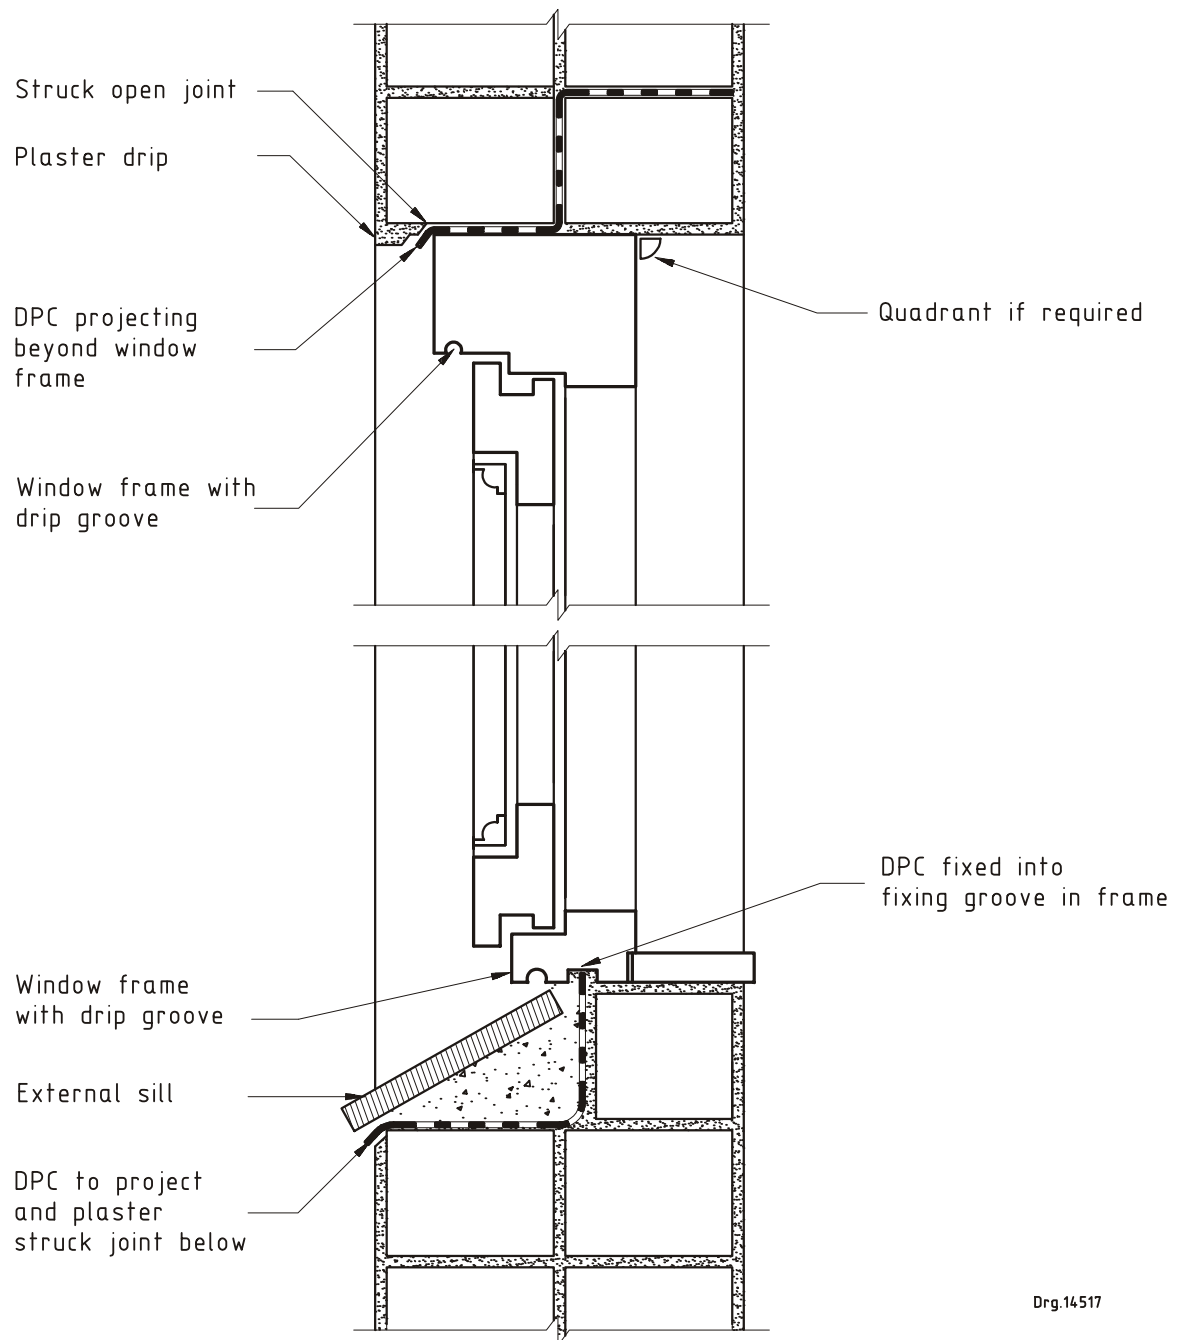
DPC at timber windows in 230 mm solid wall, plastered both sides
